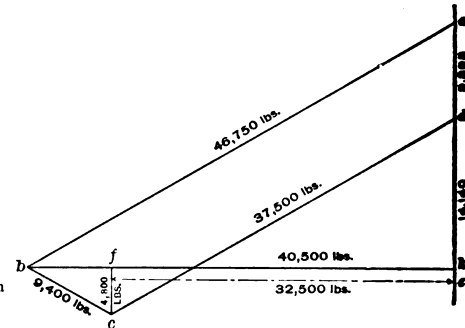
Stress Diagram of Roof Truss Shown in Fig. 1.
